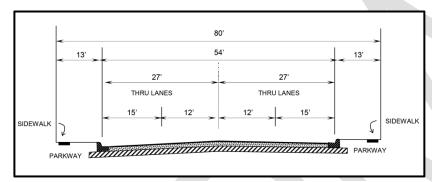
MINOR ARTERIAL CROSS-SECTION
